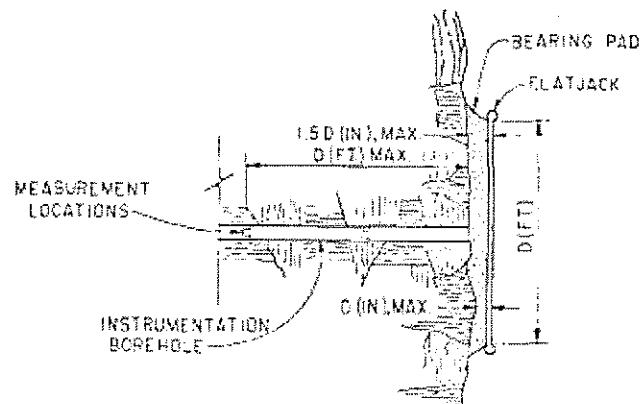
Allowable Dimensions for Rock Surface and Bearing Pad, Flexible Plate Loading Test
